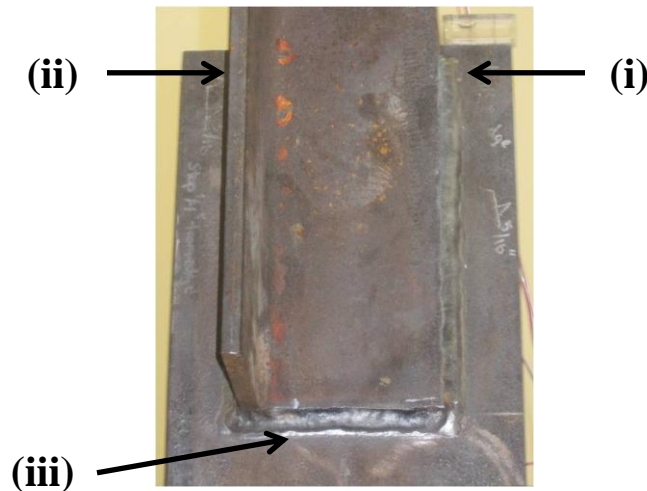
Single Angle Fatigue Crack Failure Locations
